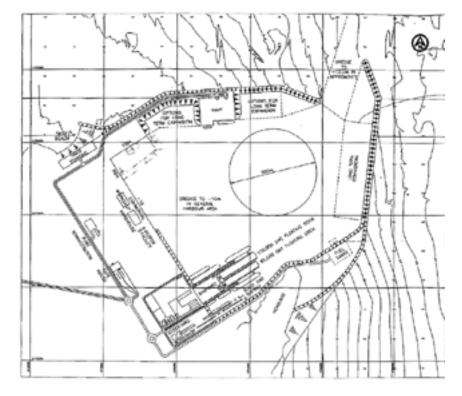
Proposed Layout Plan of Duqm Port Development
